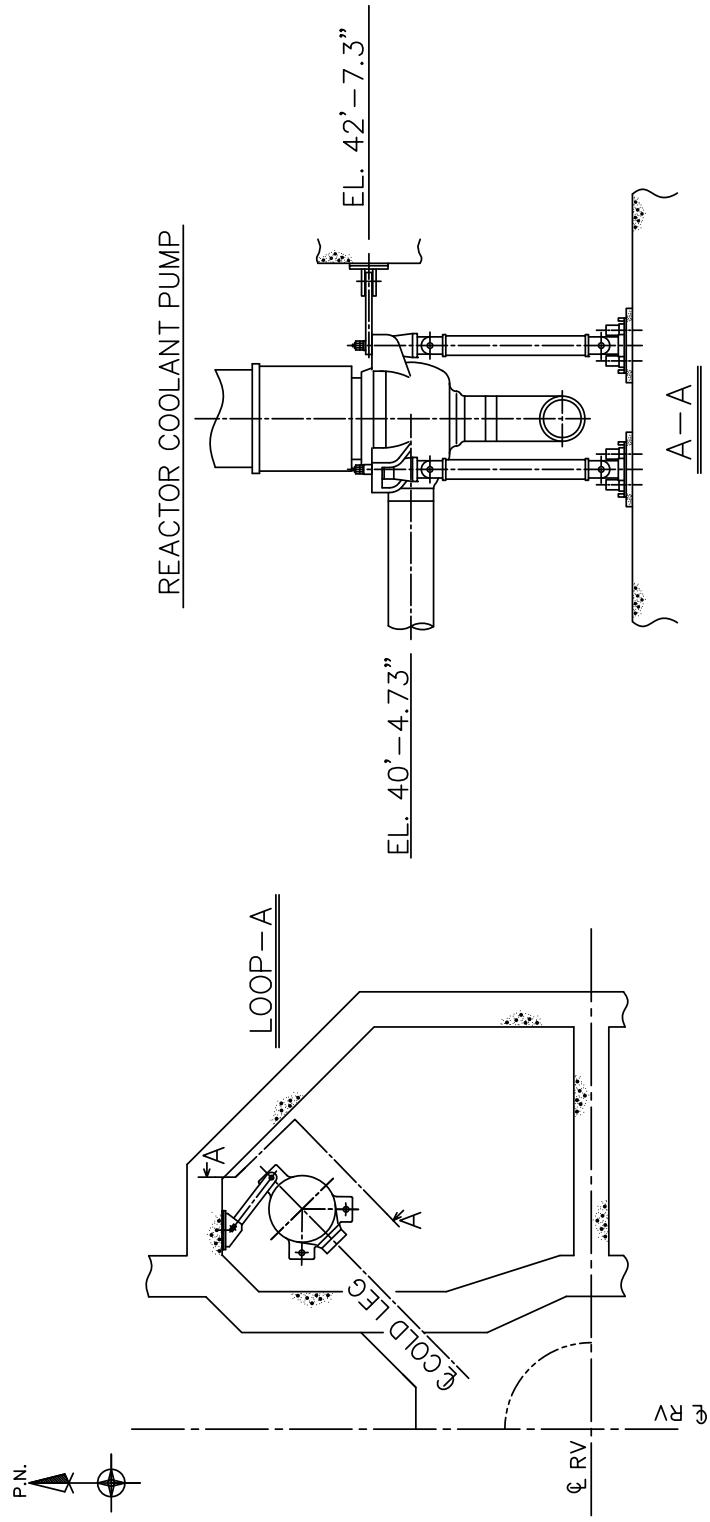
RCP Support System (Sheet 1 of 2)
